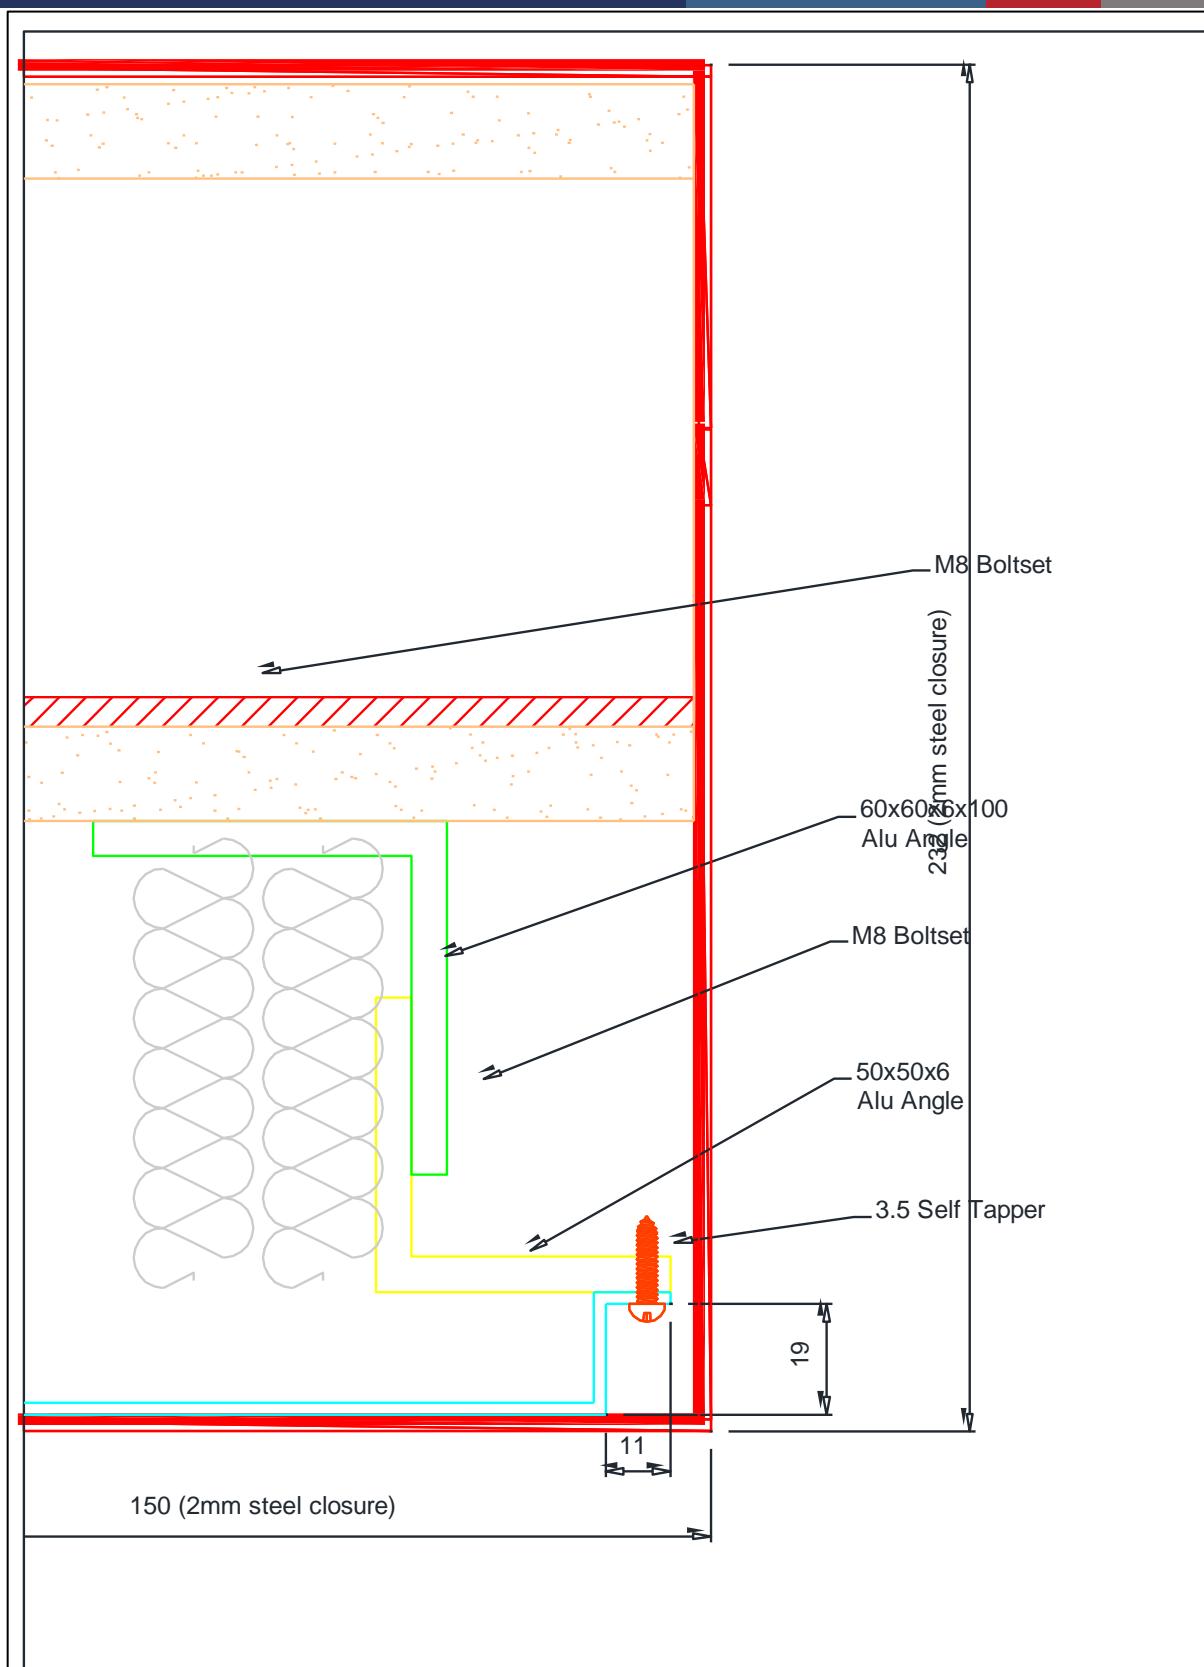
Detail D09 (Left vertical edge of window opening) of the specimen.
